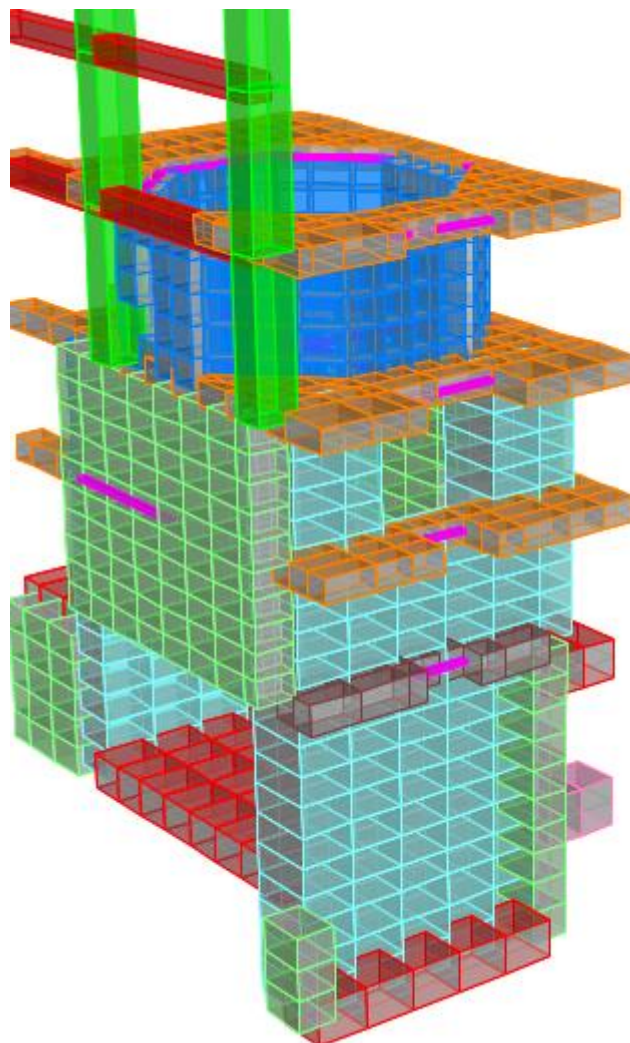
3-D model of the Powerhouse Transverse Section (modelled integral with structural system)
